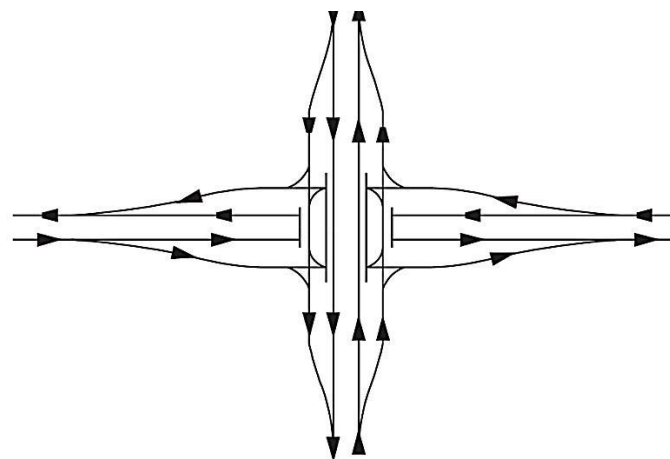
/2C: Diamond Interchanges, with Additional Structures (Third-Level Structure) [1, p.10-40]
